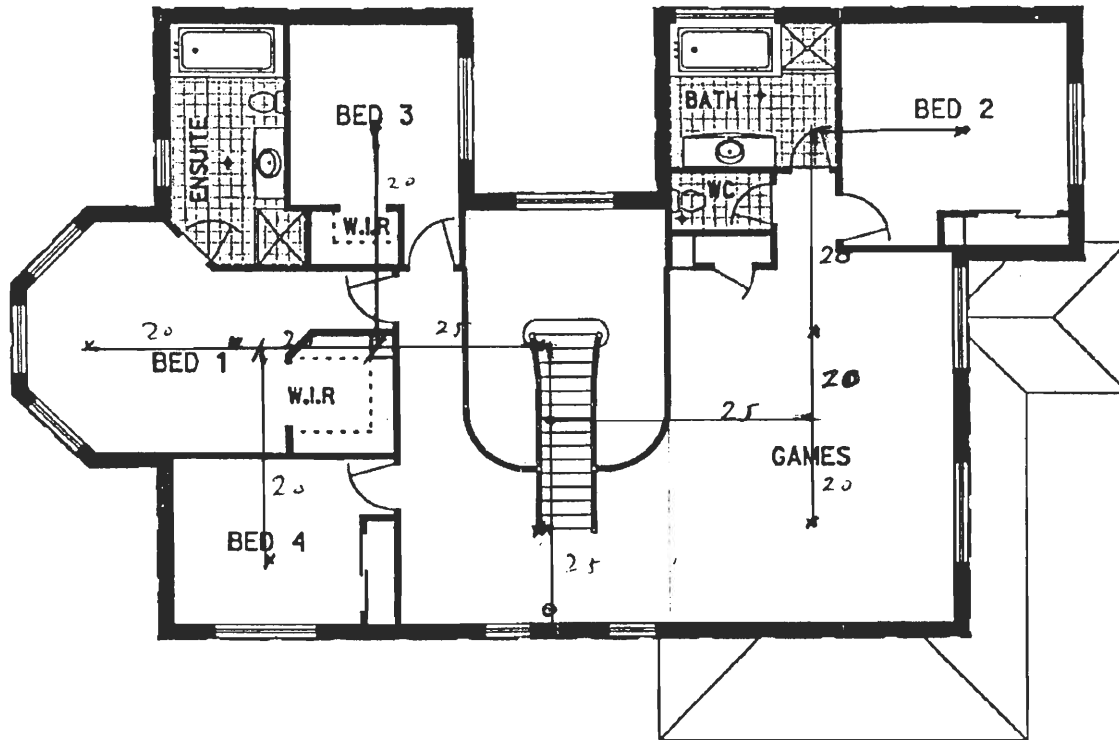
Home sprinkler system designed by Angus Eeles Plumbing first floor plan (Eeles, 2001). Home plan supplied by AVJennings (AVJennings, 2001B).
